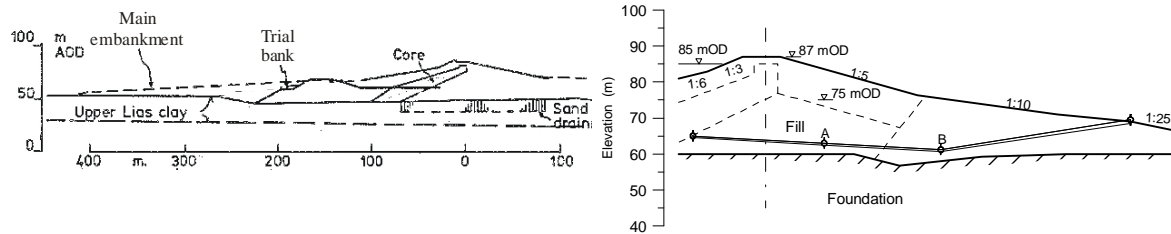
(a) Typical cross section of Empingham dam showing location of trial bank, and (b) ‘north section’ of main embankment with position of rod gauges.
